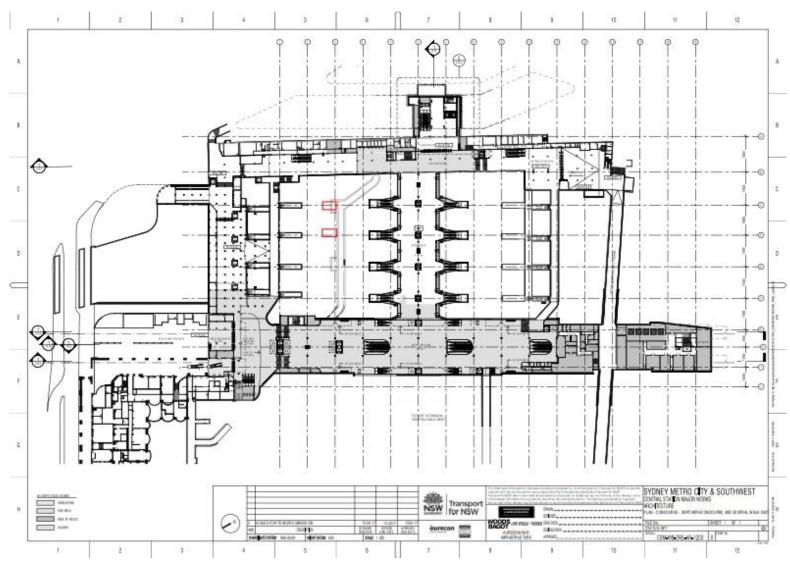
Proposed location of the excavation for the future temporary staircases on Platforms 20/21 and 22/23 (Source: Laing O'Rourke, 2018).
